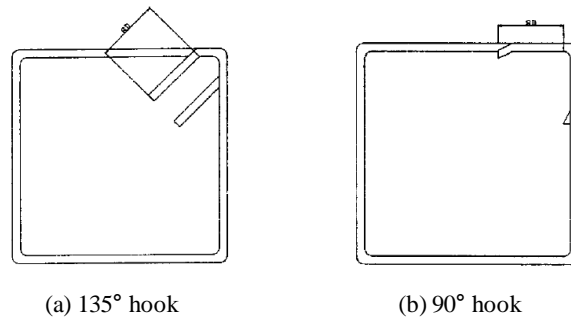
Detailing of 135° hook and 90° hook (Lam et al., 2003)
